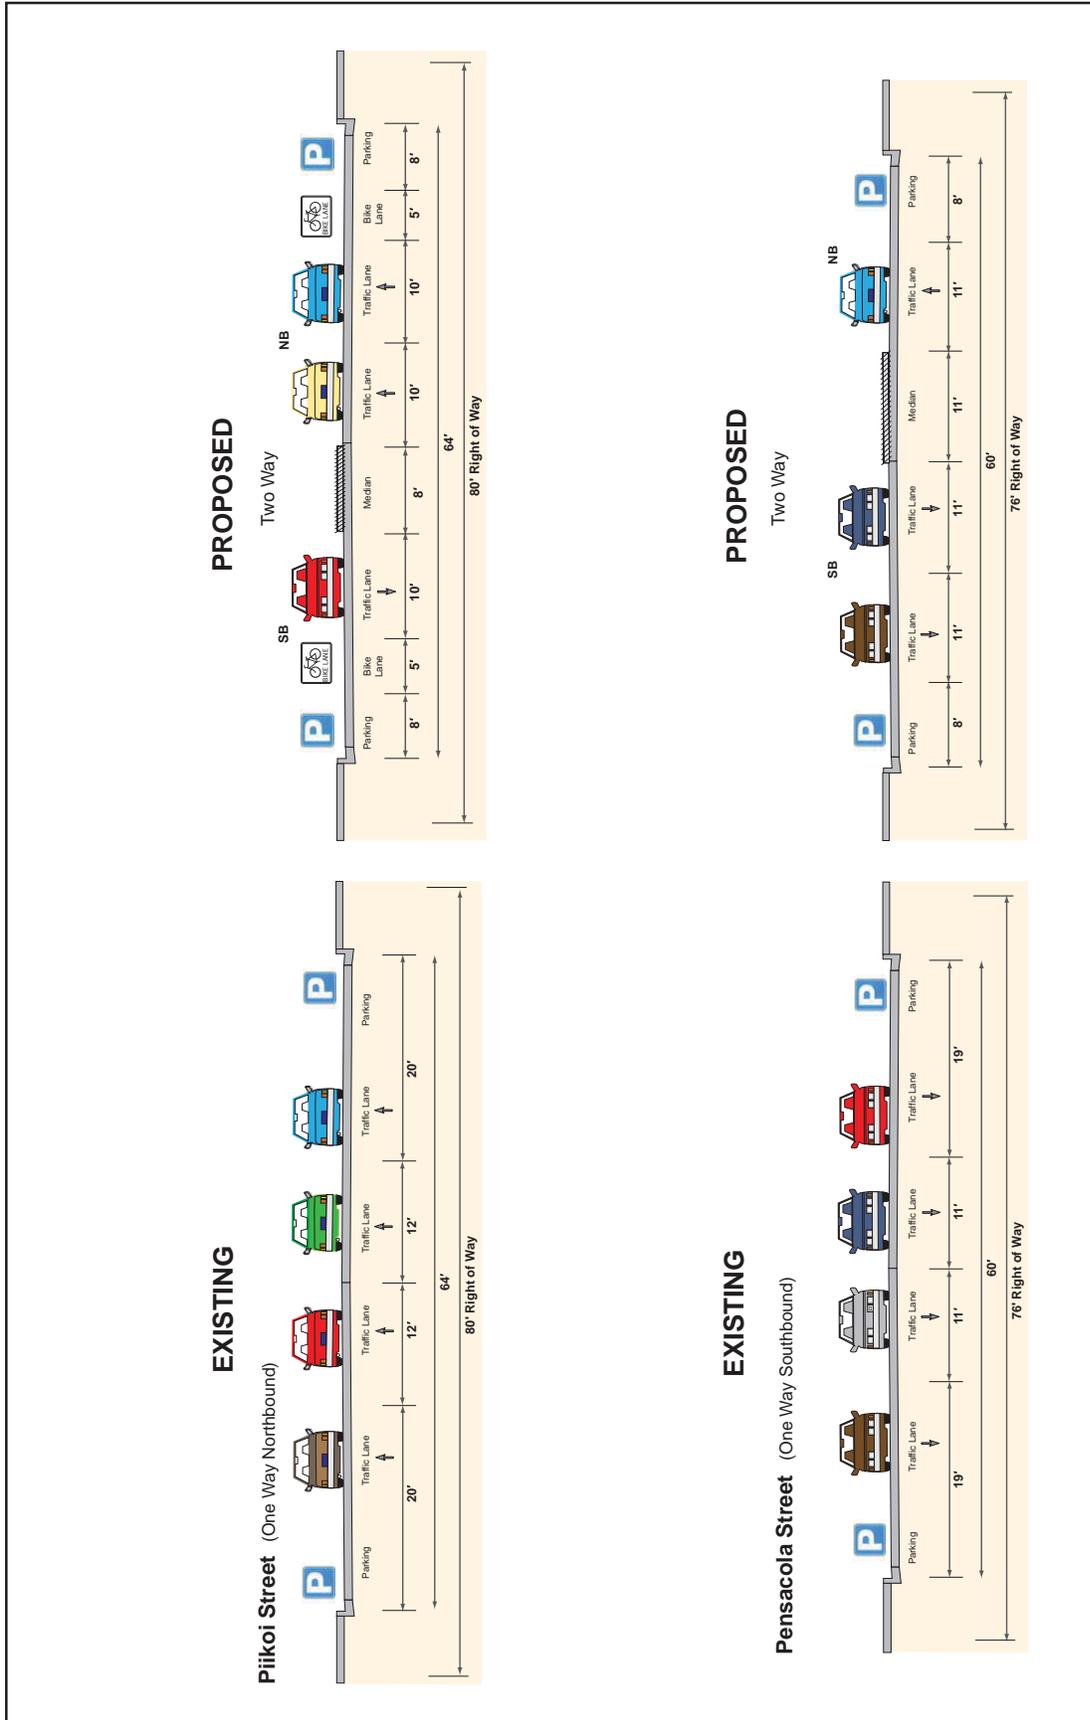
Draft Mauka Plan Roadway Cross Sections
